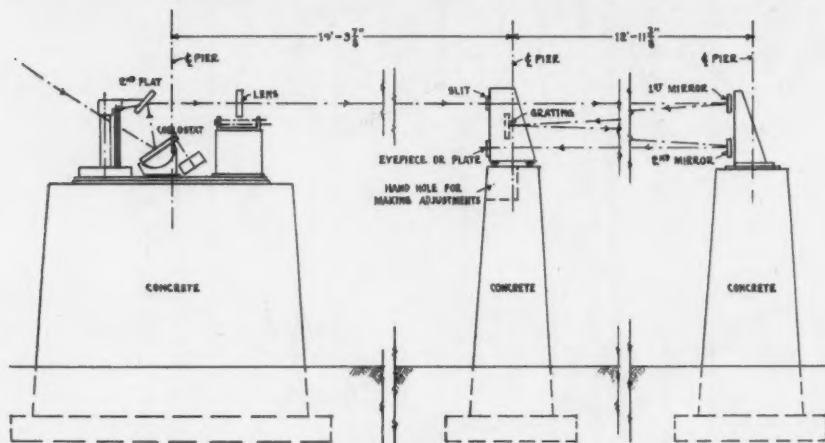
Concrete piers for coelostat telescope and spectroheliometer
